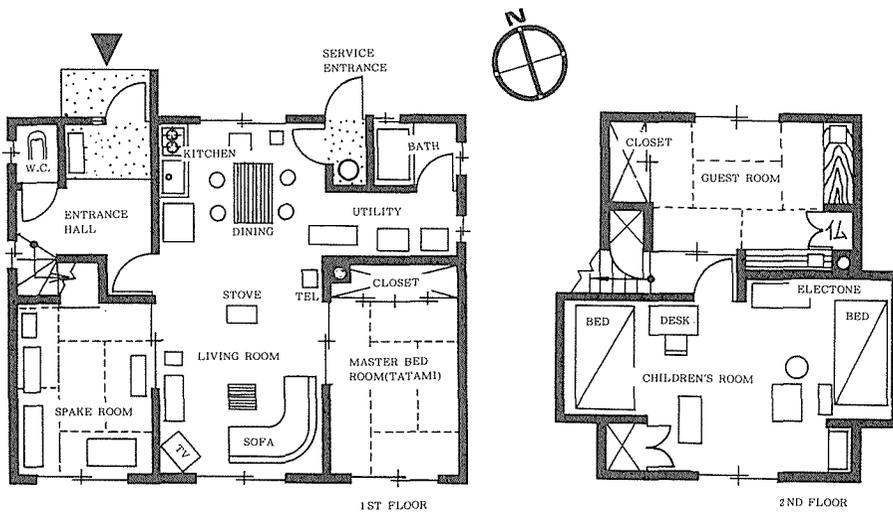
The typical plan in Sapporo. The living room is in the center with various rooms around it.
